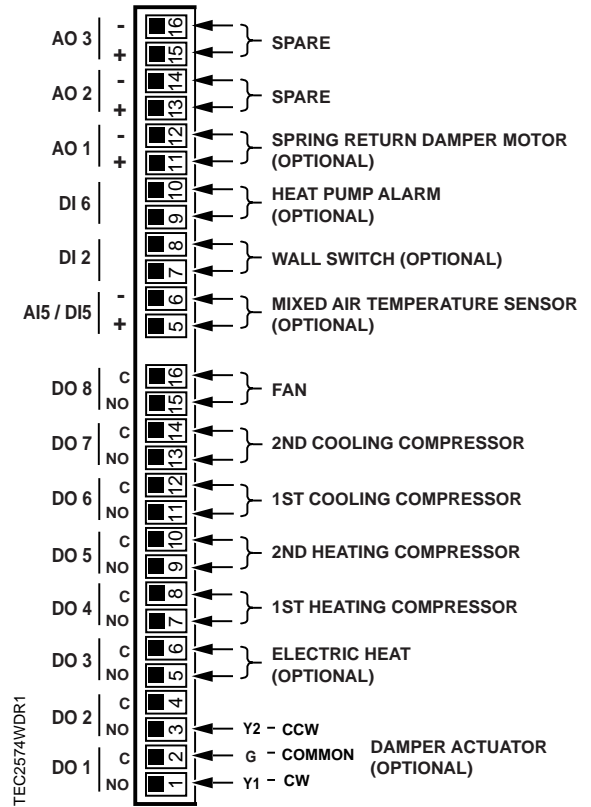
Application 2574 (Multiple Heating and Cooling Heat Pump without Reversing Valve Control and with Mixed Air Control).
